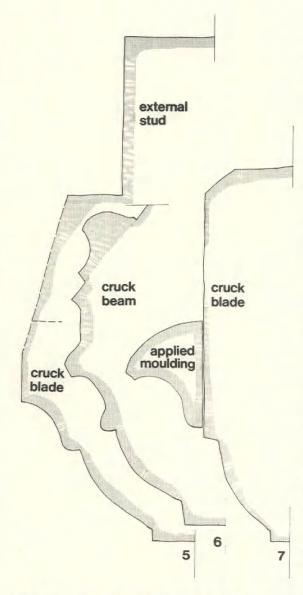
Moat Farm, Marston Moretaine. Cruck truss mouldings 5-7. Scale ¼ full size
